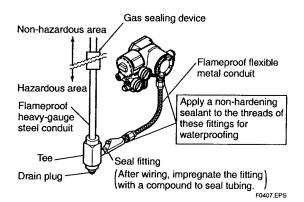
Typical Wiring Using Flameproof Metal Conduit
